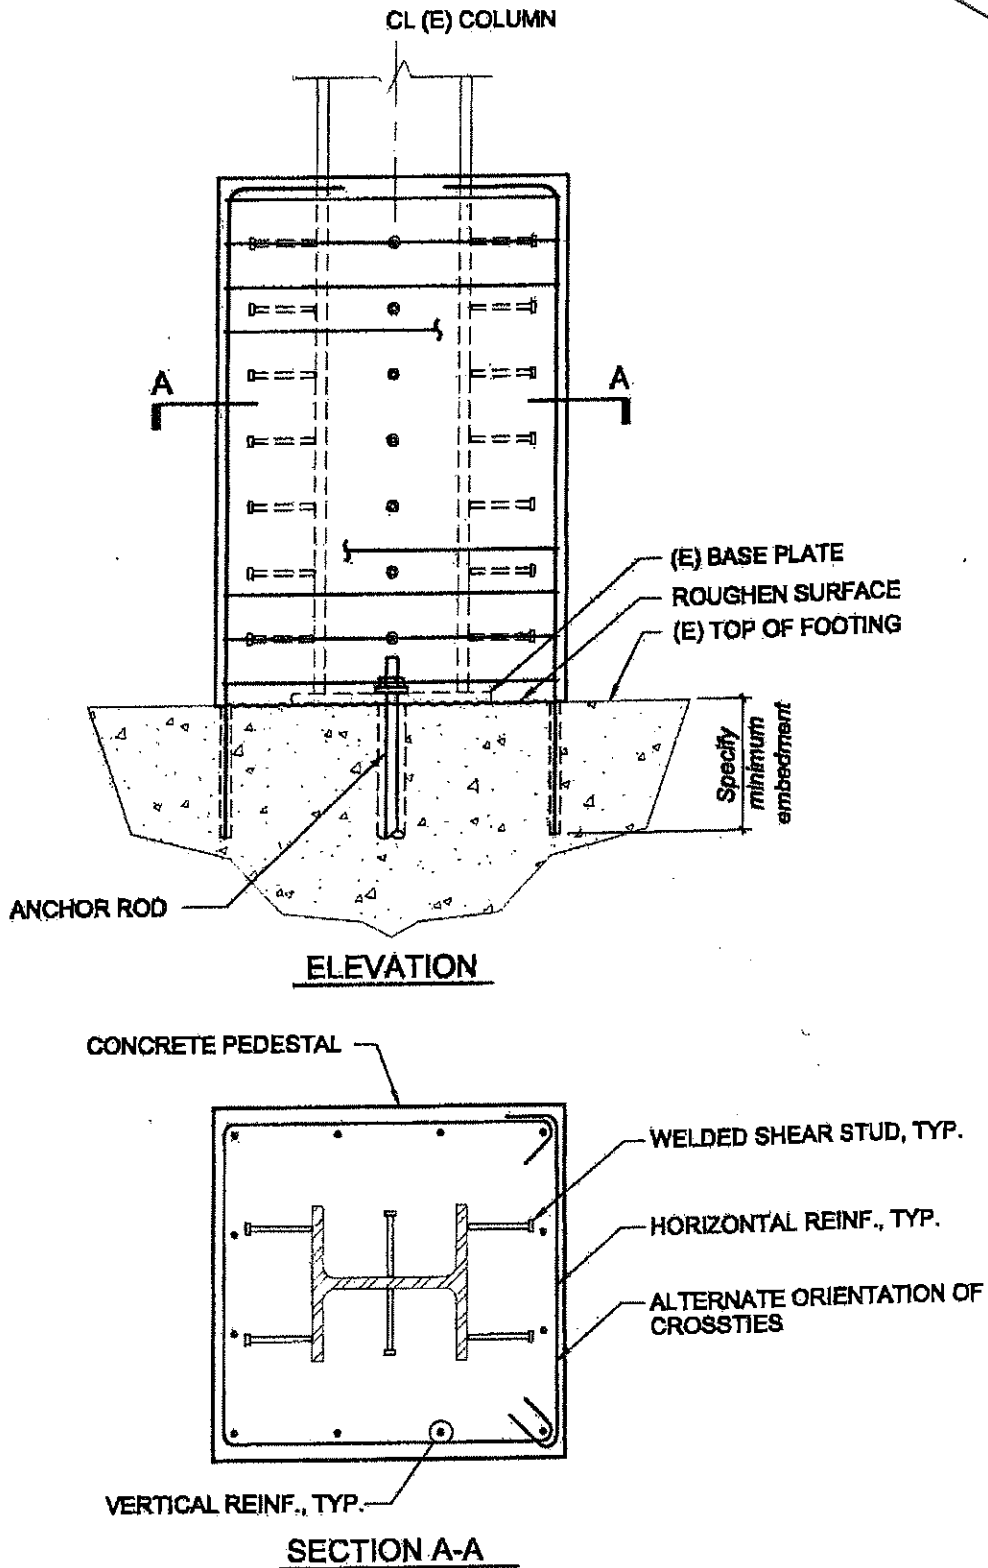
Concrete Pedestal at Existing Column
